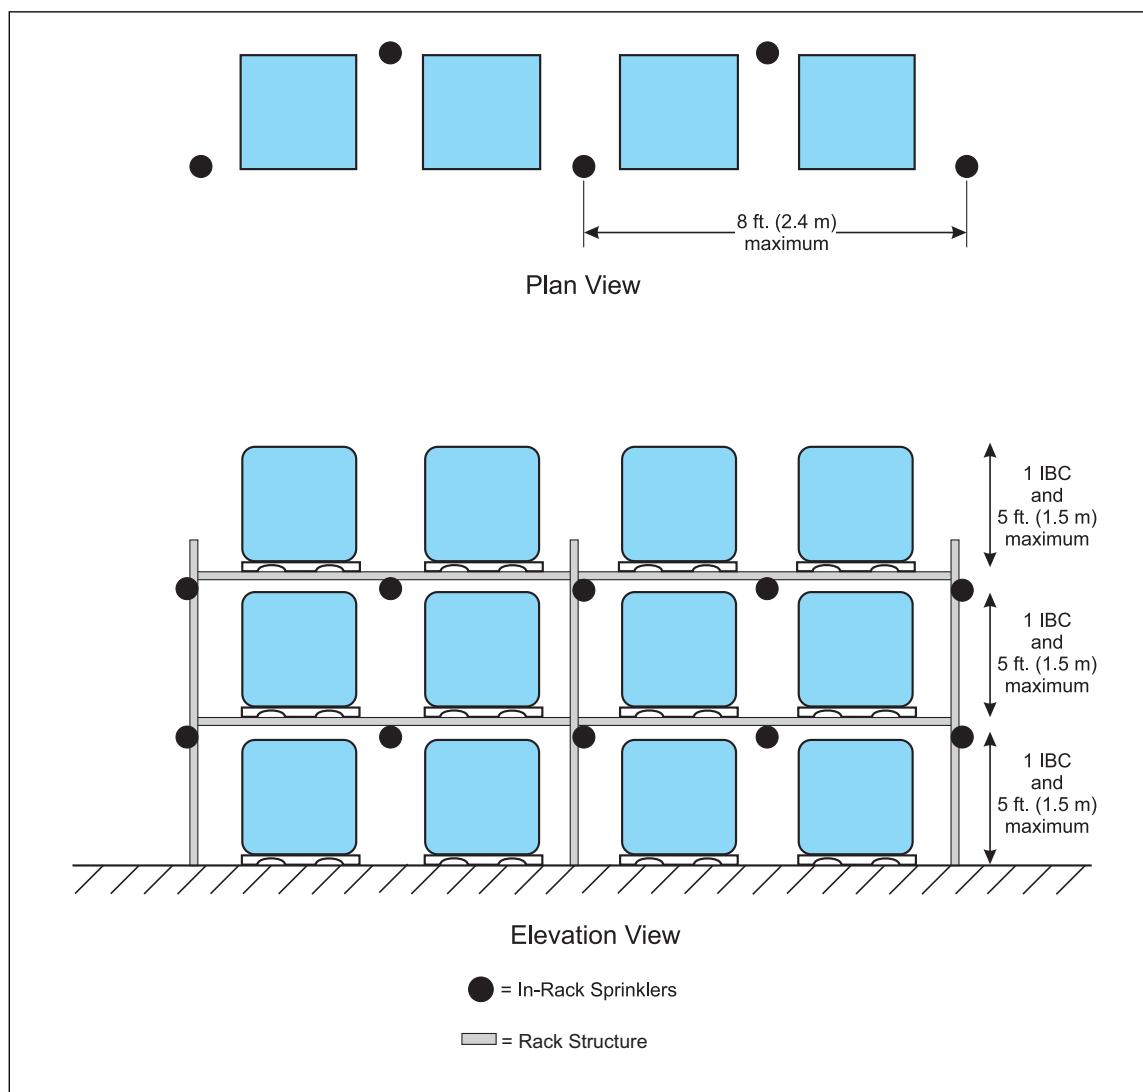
Single-row rack sprinkler layout: IBC protection scheme
